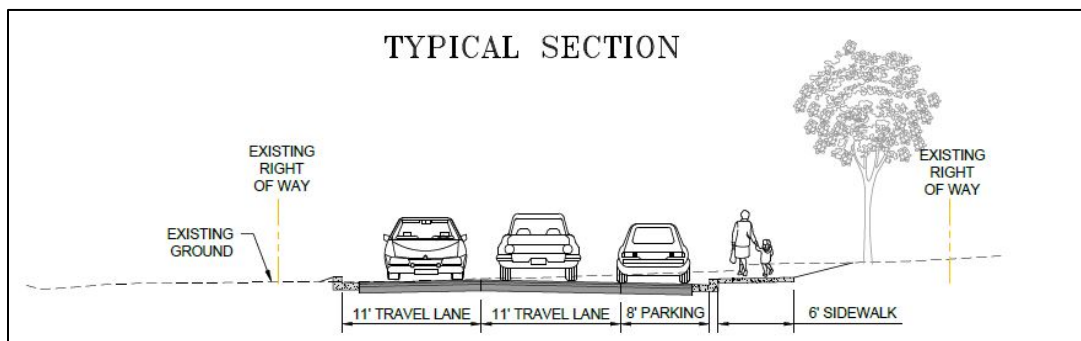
North High Street Extension Alternative 1 – Cross Section for eastern section
